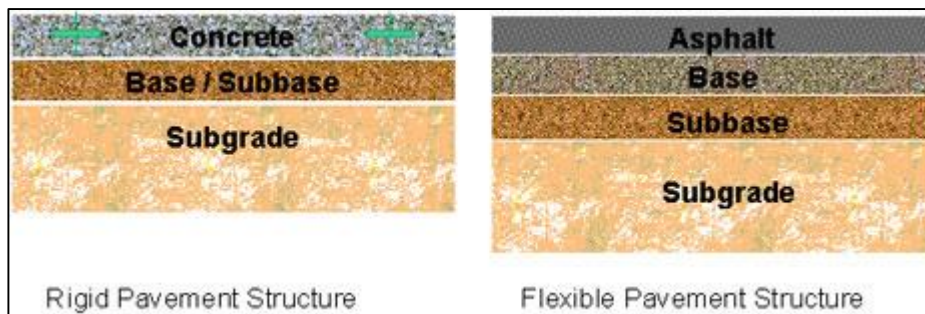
Typical Flexible and Rigid Pavement Layers (Concrete, 2016)
